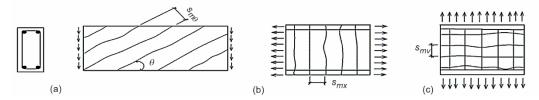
Crack spacing of regenerated concrete beams; (a) diagonal crack, (b) vertical crack, and (c) horizontal fracture
